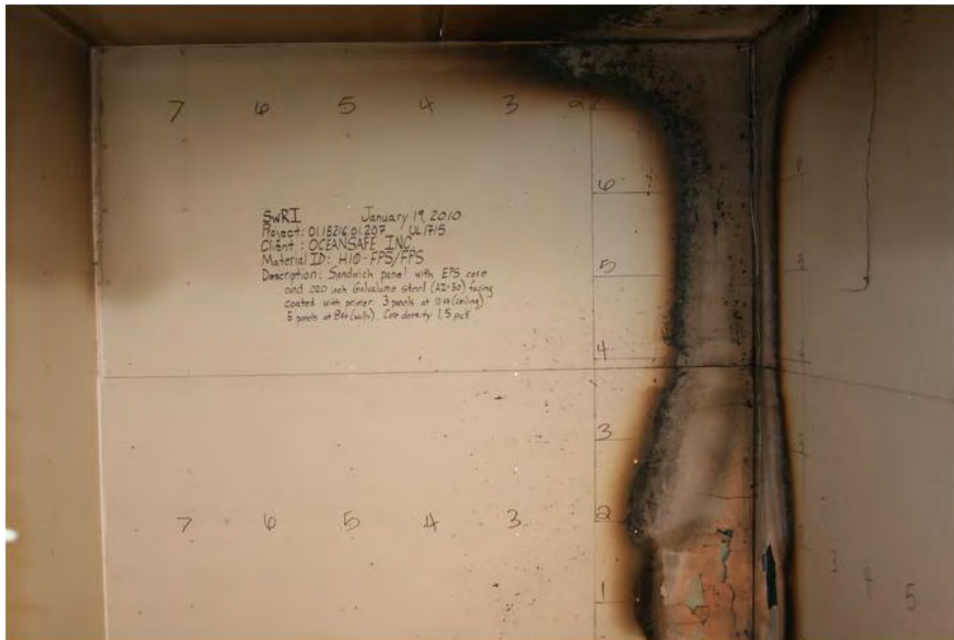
Post-Test View No. 1 of Burn Corner with Gypsum.
